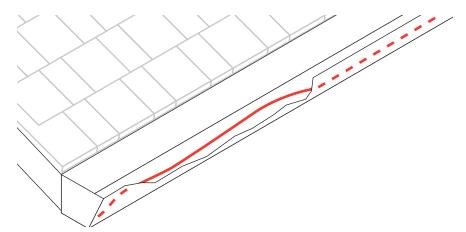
Layout in standard gutters - up to 6" (16 cm) wide
